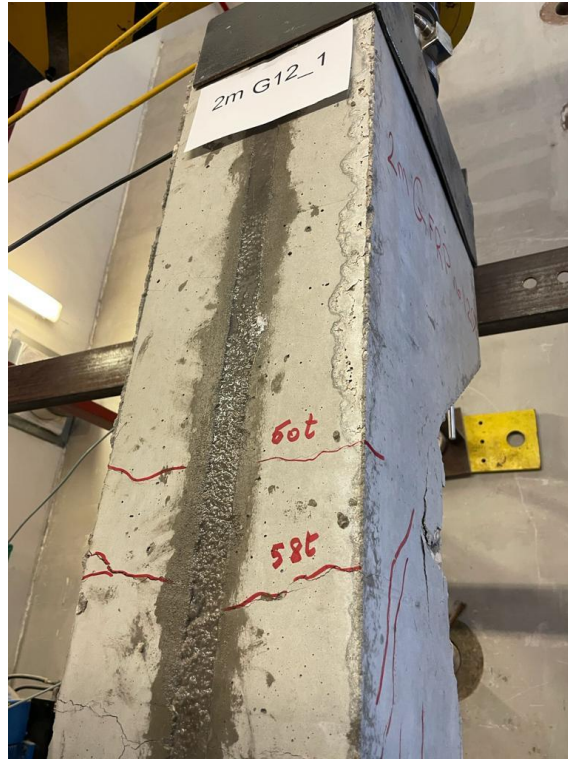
Cracks at the tension side of Column 2-C12-1
